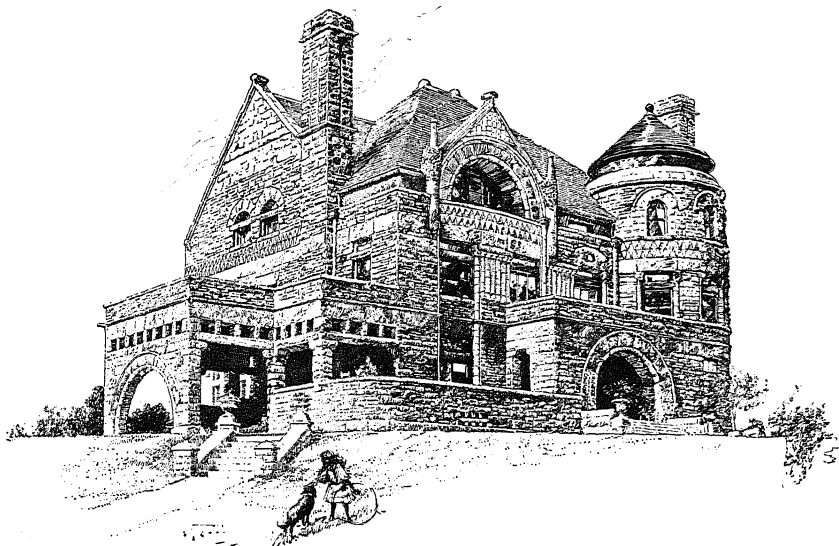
Mould & McNichol. Dwelling in St. Paul.
